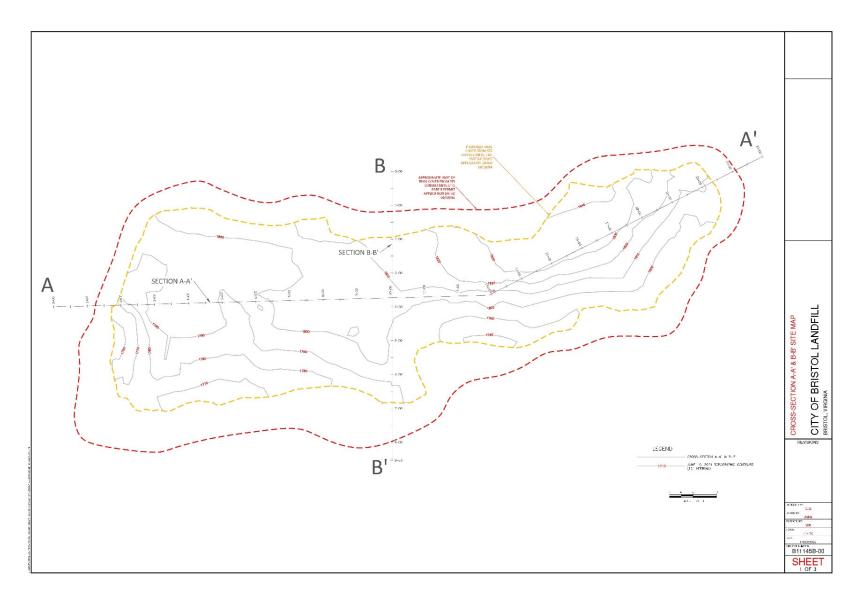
Plan view of Bristol Quarry Landfill with 2021 topographic contours of the landfill surface (Draper Aden Associates) and location of cross sections A-A' and B-B'. Drawing modified from Draper Aden Associates.
